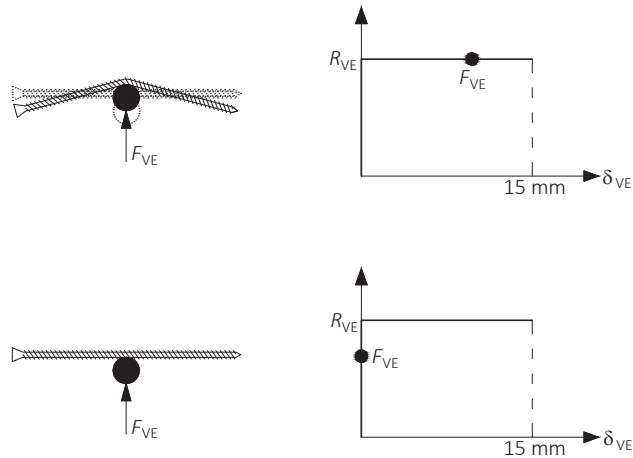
Above: „soft“ reinforcement, below: „hard“ reinforcement. (Blass et al., 2006)
